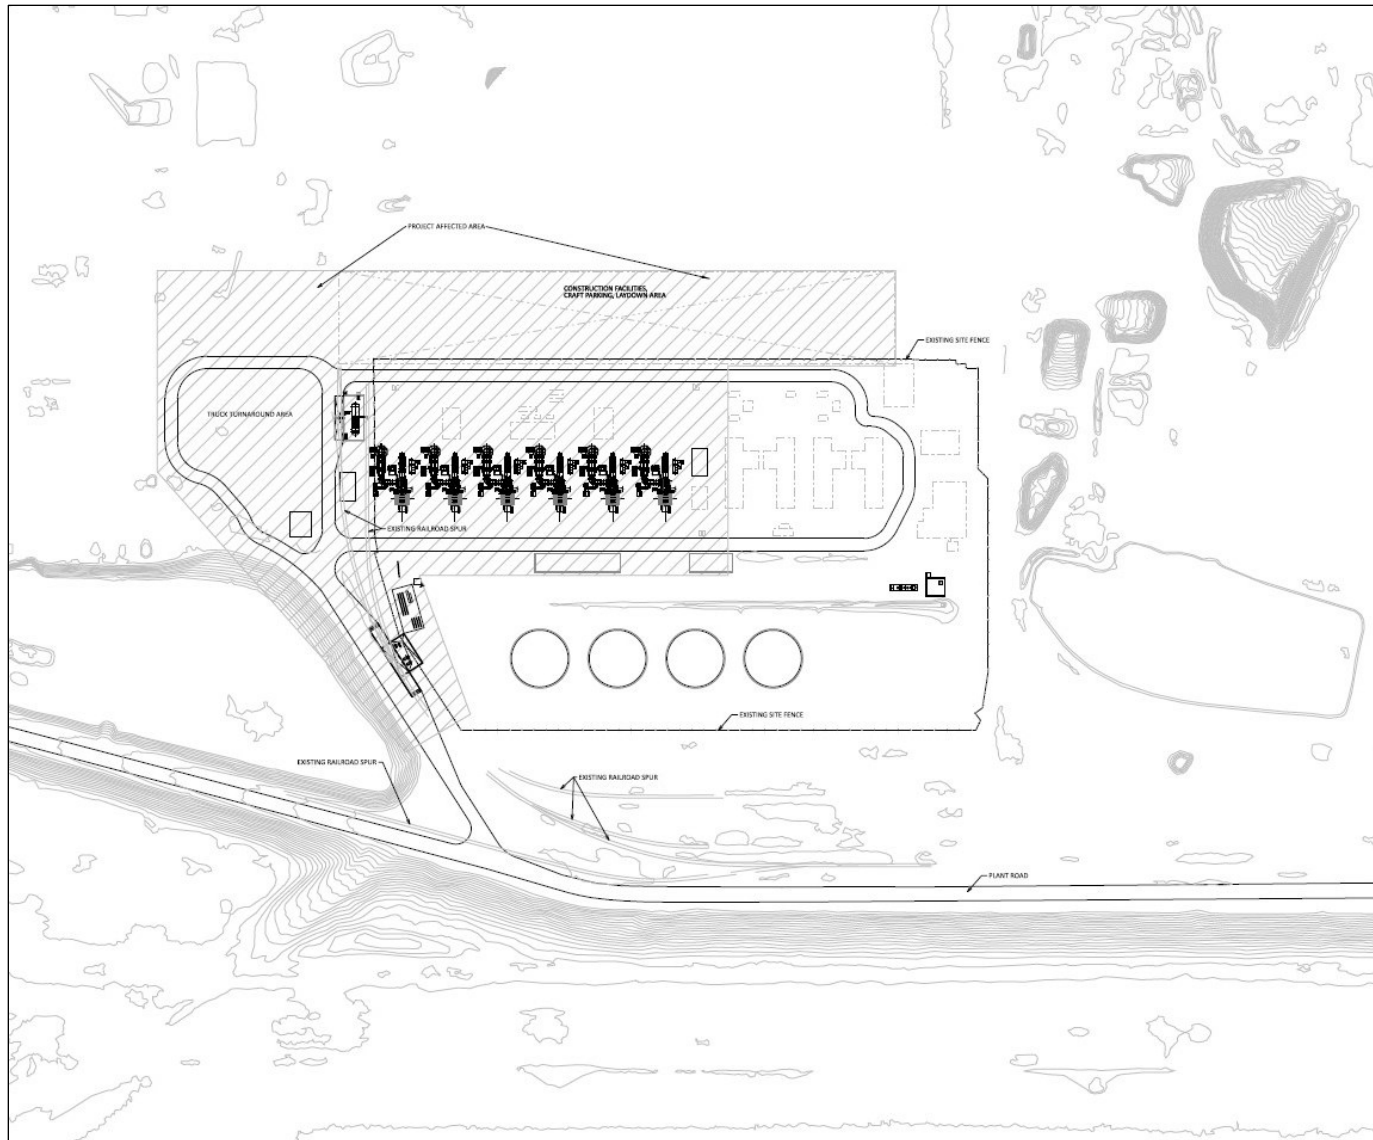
Proposed layout, superimposed over existing plant facilities. Current project footprint is the shaded area, which includes proposed locations of the six new Aero CT units (where existing CT units are located) and construction parking and laydown areas.
